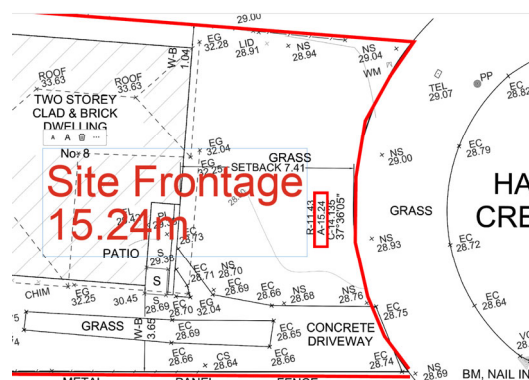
The Subject site has a site frontage of 15.24m as identified on the survey Plan prepared by C&A Surveyors
